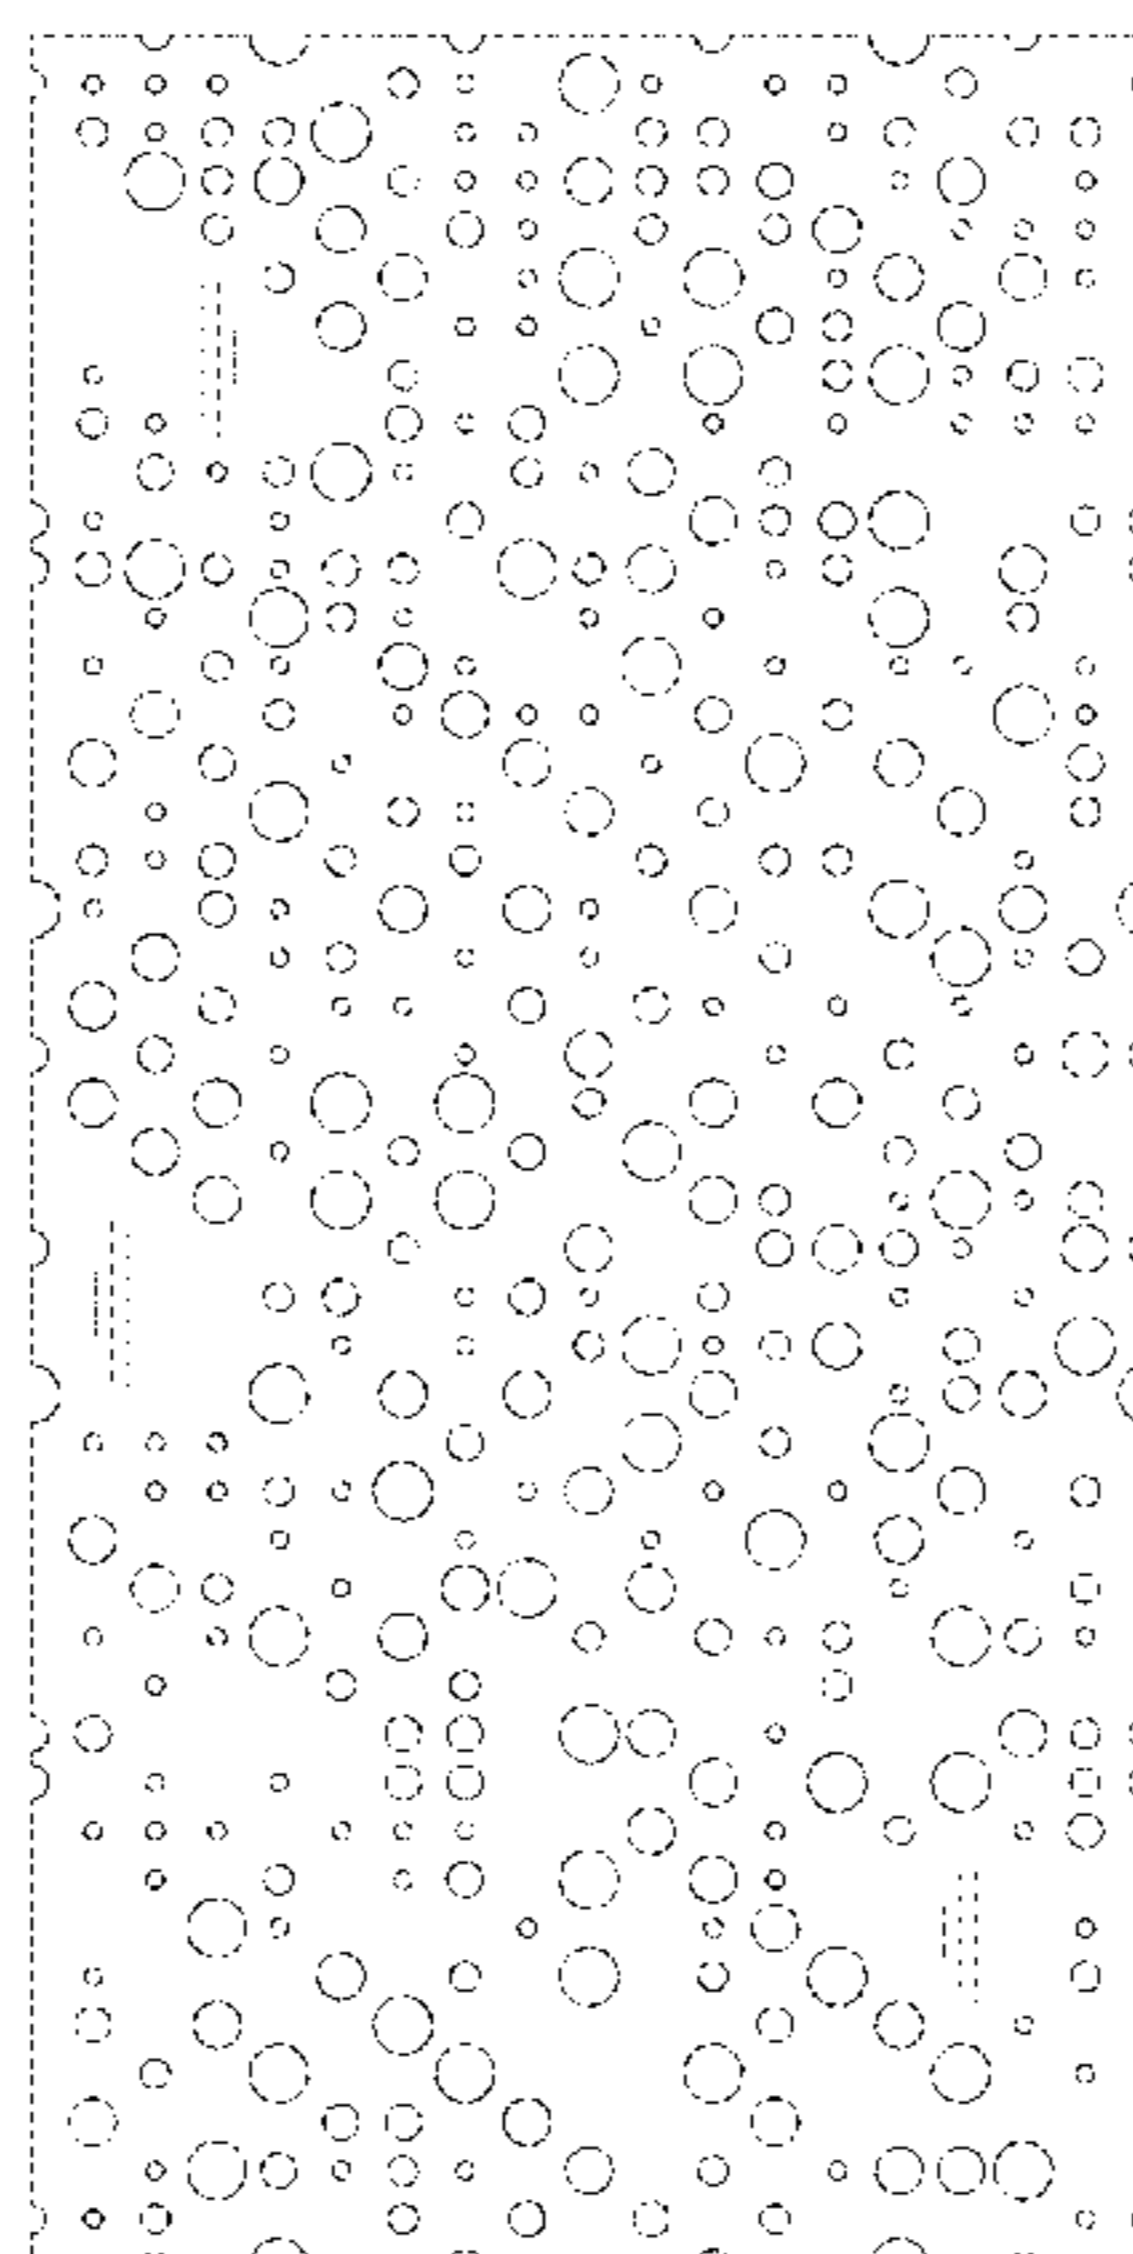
is a front elevation view of an architectural panel according to a fourth embodiment of the new design, the rear elevation view being a mirror image of the front elevation view.
